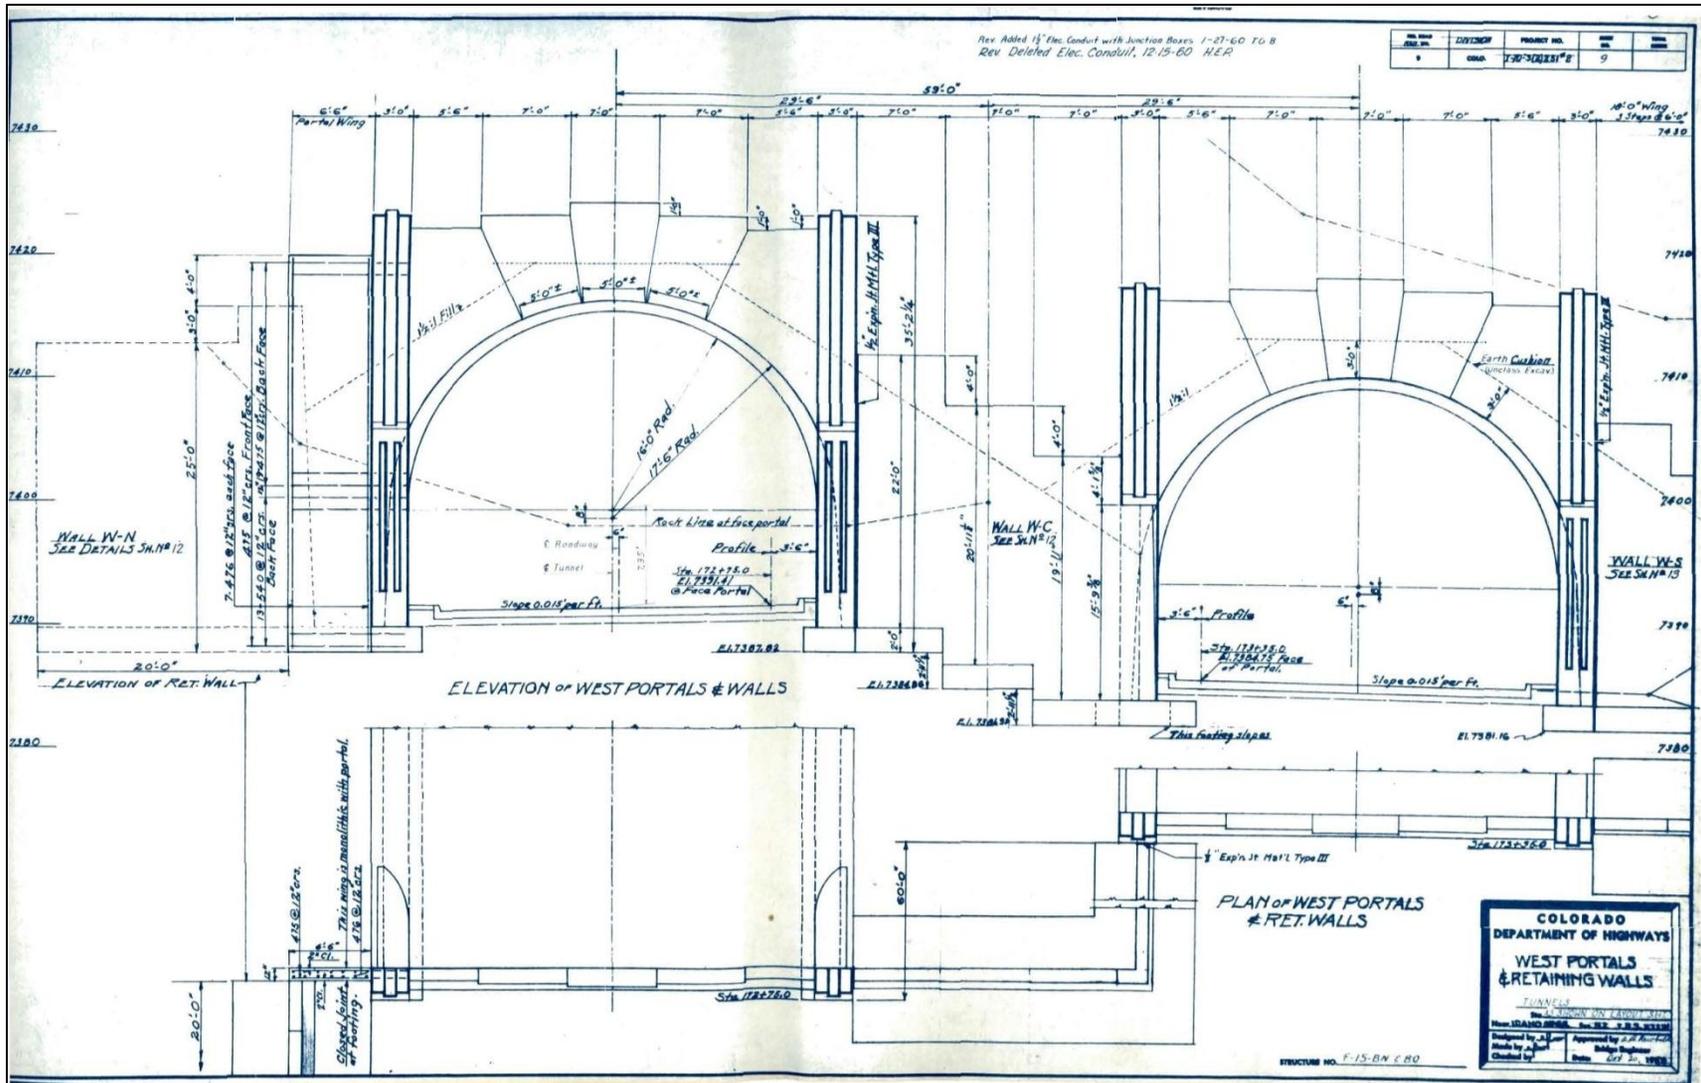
Twin Tunnels As Built Plans (Sheet 9). Details of west portals and retaining walls.
